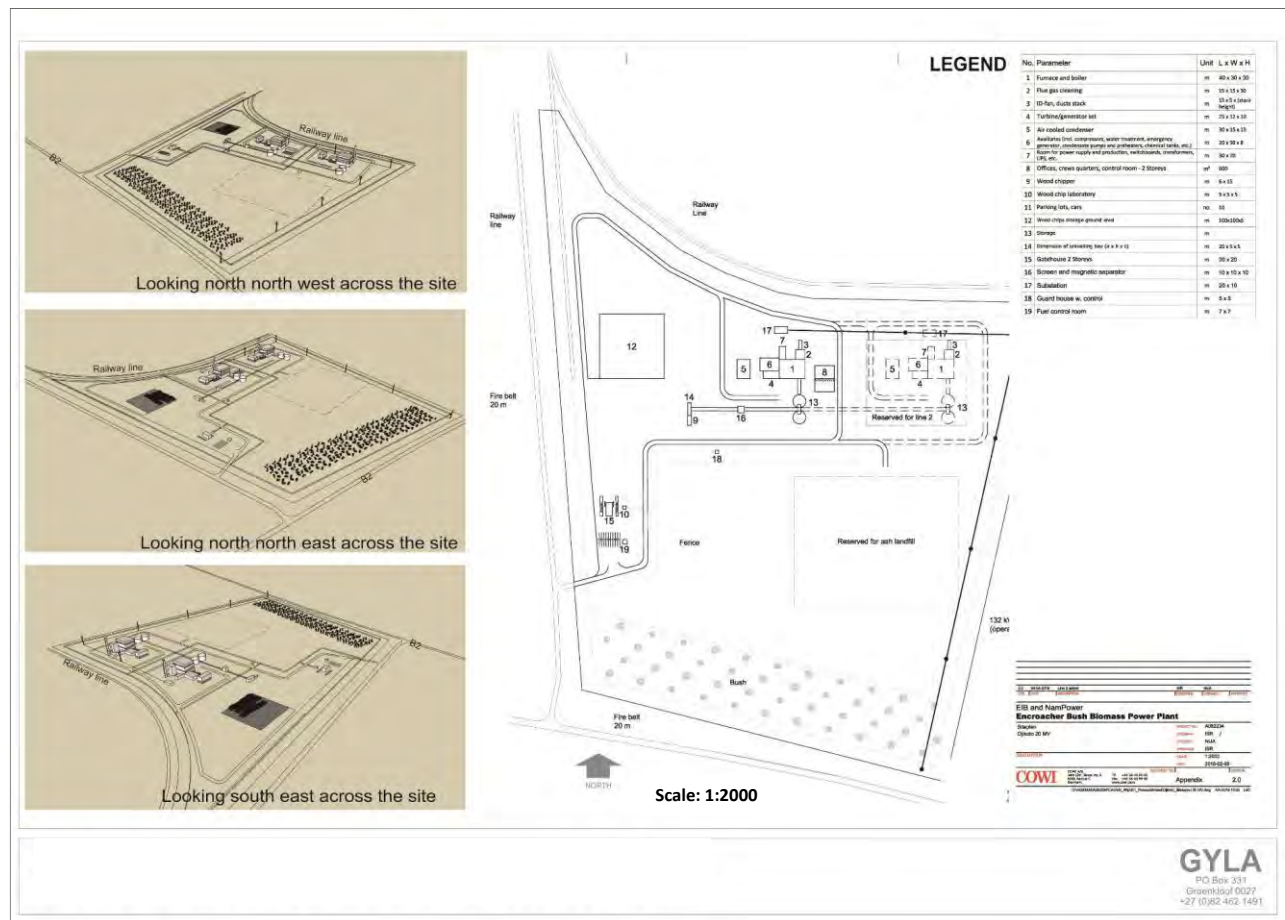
PROPOSED POWER STATION LAYOUT⁵ (YOUNG, 2018)
